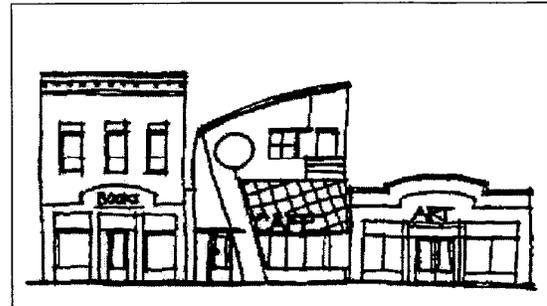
Exotic roof forms such as the dramatic curves found on the above center building are not appropriate in the Downtown District.
